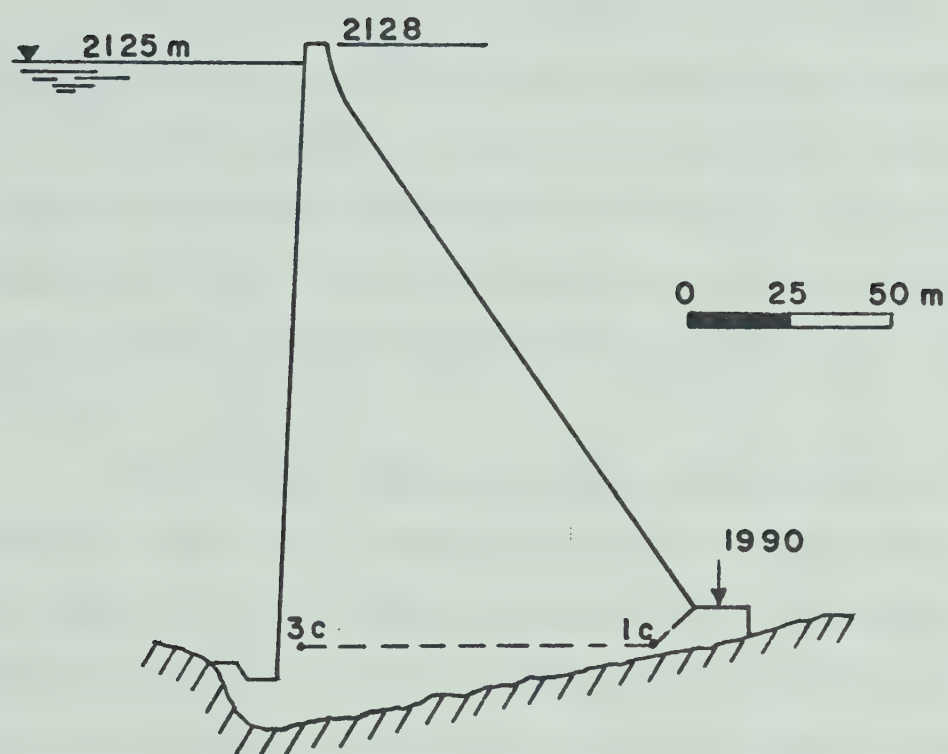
SECTION OF ALPE GERA DAM
